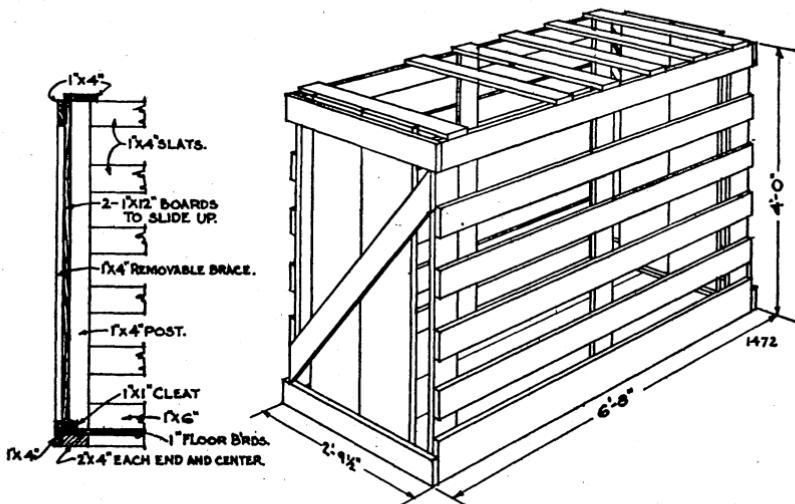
Detailed plan for construction of shipping crate. (Design No. 1472)
